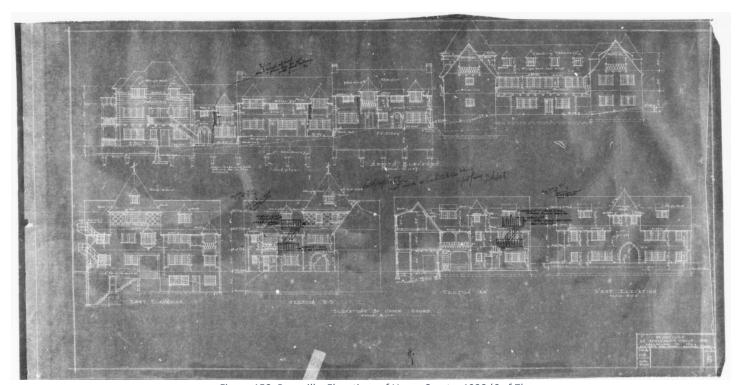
Beauville, Elevations of Upper Court – 1928 (6 of 7)
